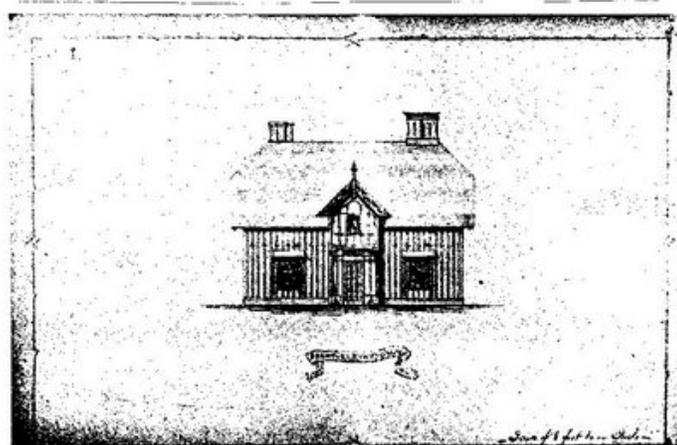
Plan of the Cottage (east elevation), c. 1850
